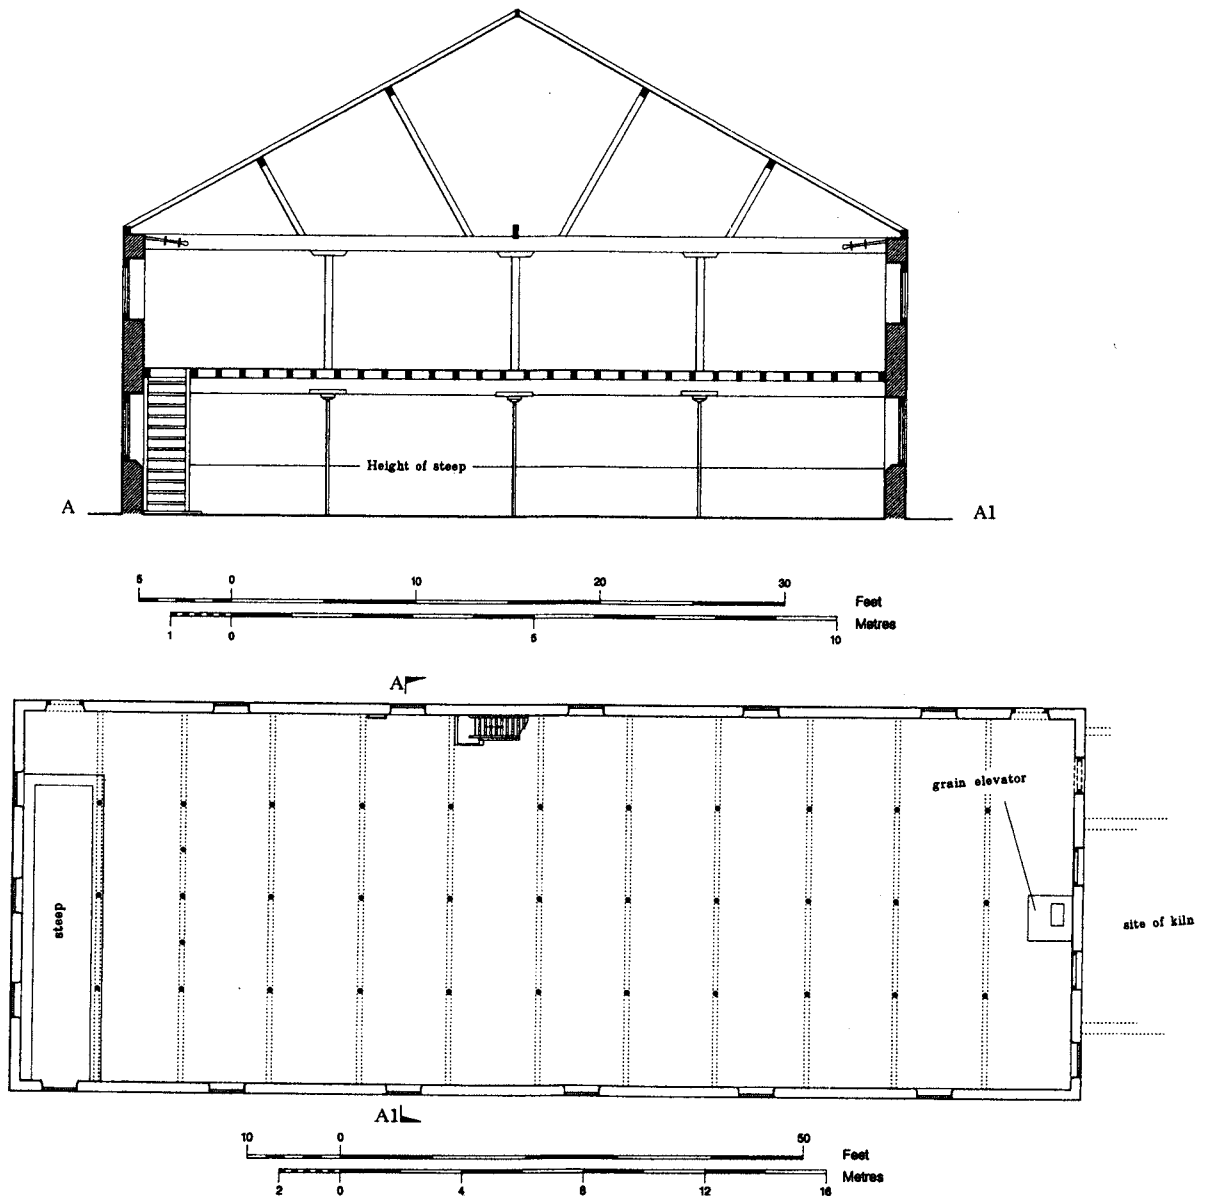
Malthouse No. 7, ground plan and section (© Crown Copyright. NMR).
